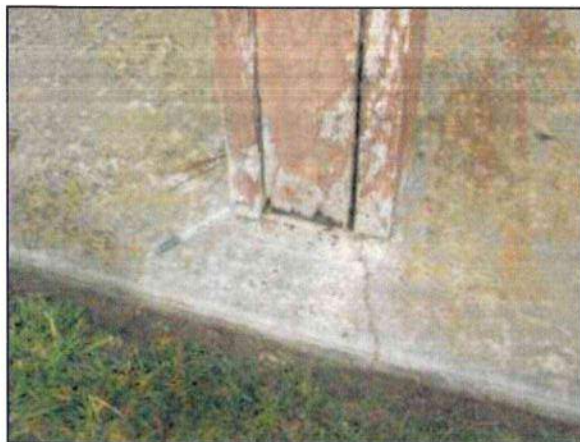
Fire Station #4 A structural post located at the front porch is rotted at the base.
